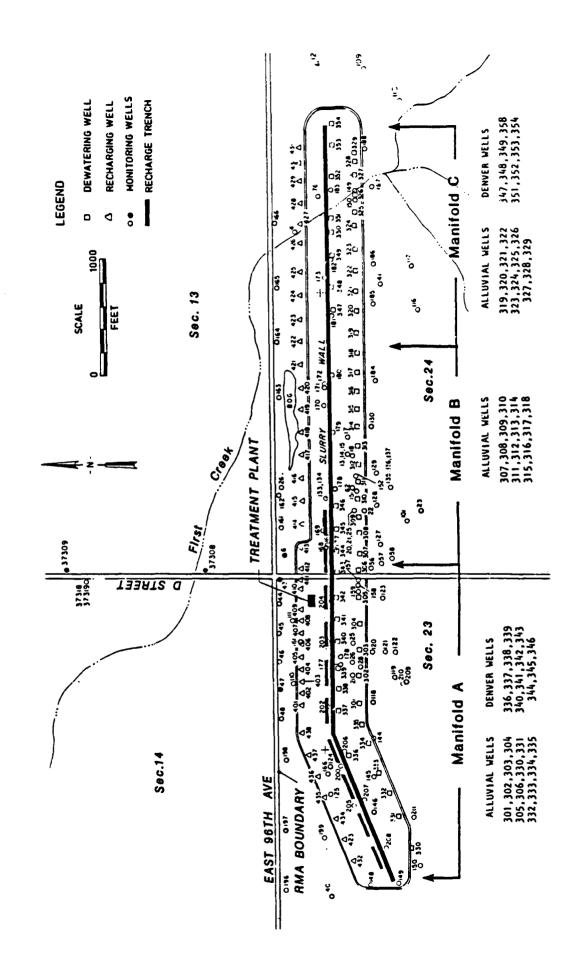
Slurry Wall barrier and recharge trench system at North Boundary.
